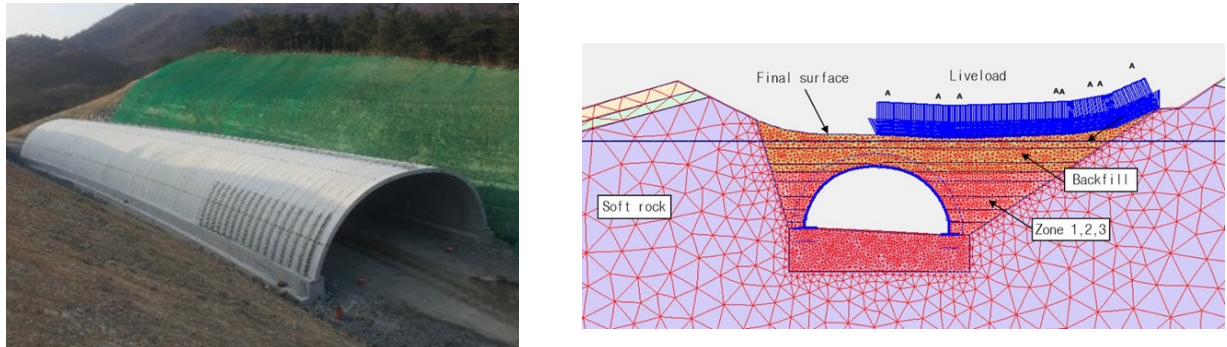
Large span precast arch tunnel constructed on asymmetric slope section
